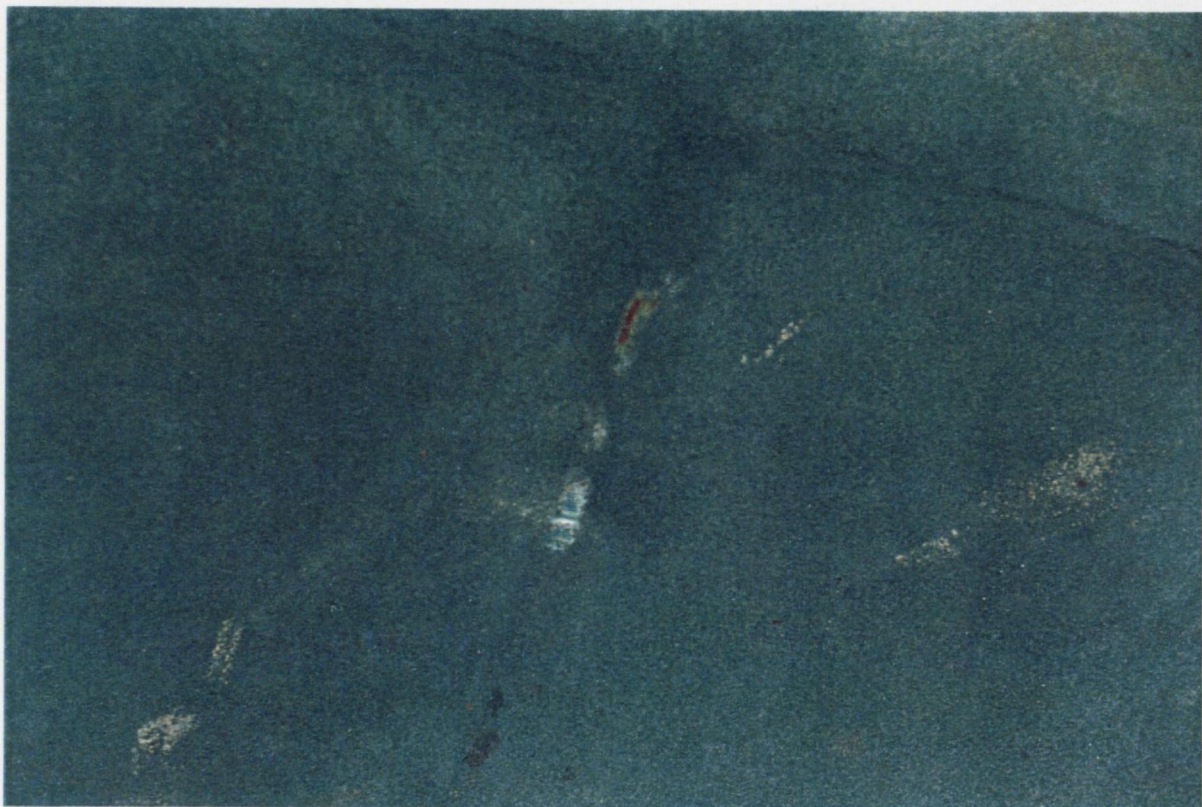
Damage to Weld Seam by Helicopter Skids
